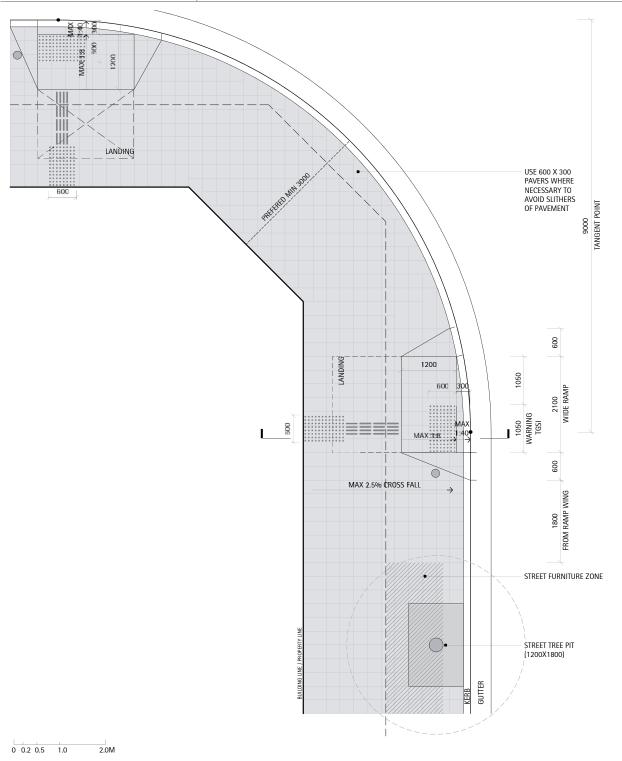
Streets Corner Plan: 9000 Radius 2100 Ramp
